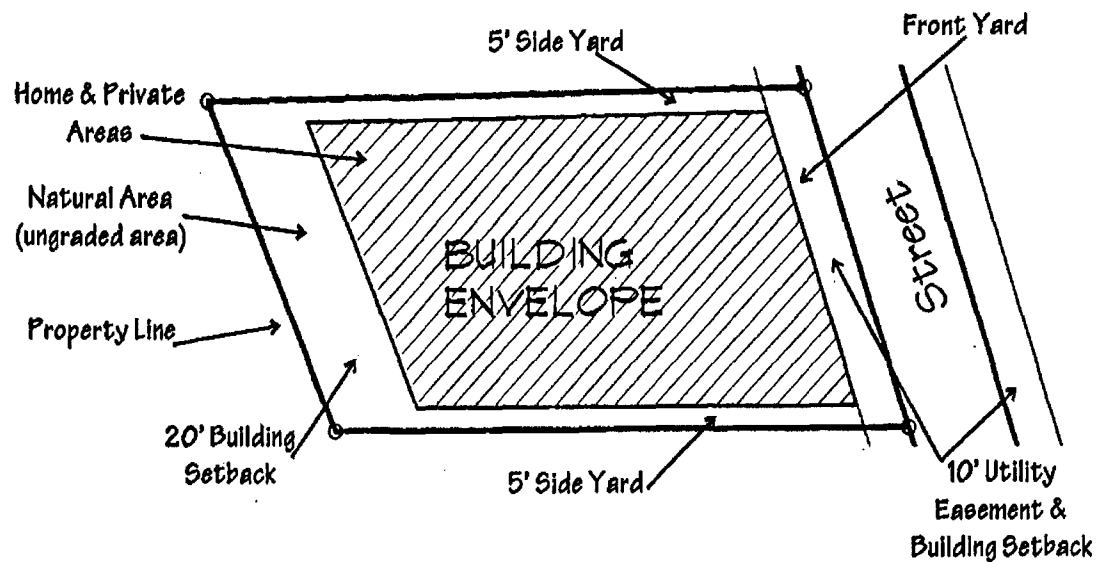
Building Envelope and other designated areas of the Retreat Homesites
